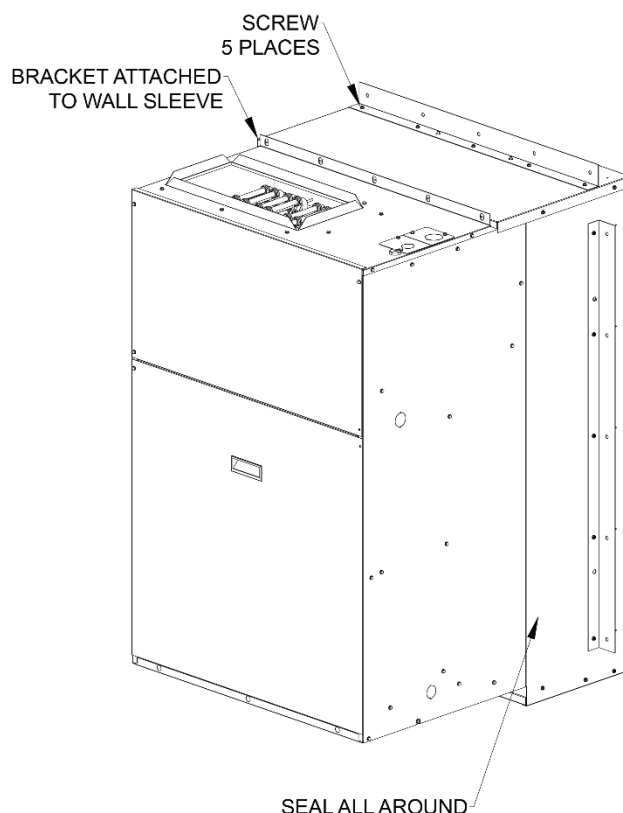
Top Mounting Bracket Installation on Wall Sleeve
